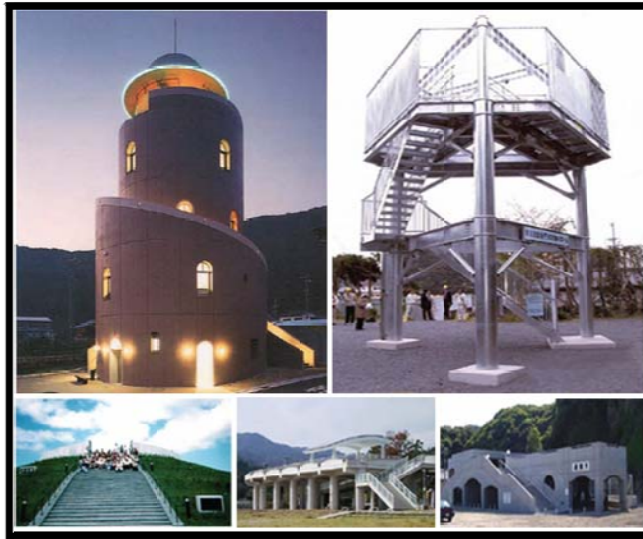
16. Vertical Evacuation Structure, examples from Japan (FEMA, 2008b; 2008c)
